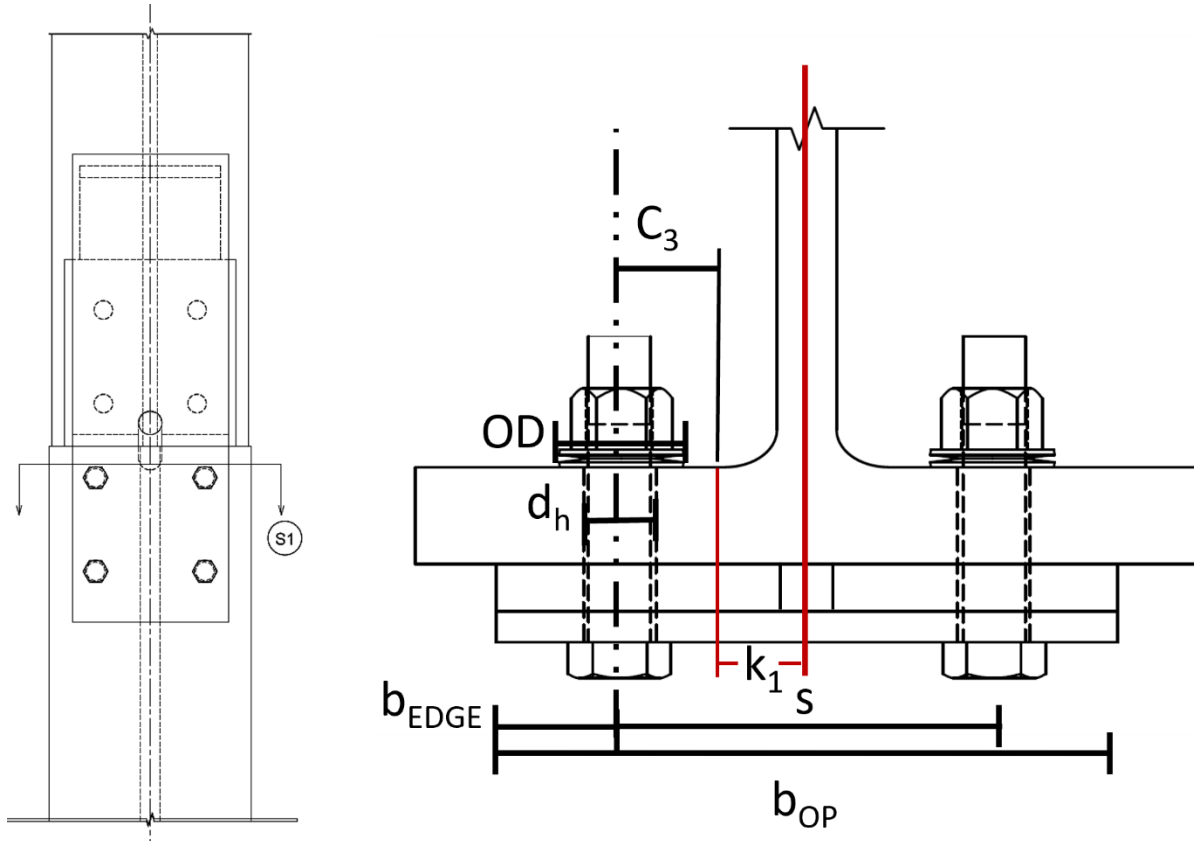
Dimensions used to determine the maximum column fillet size of the Lower Column.
